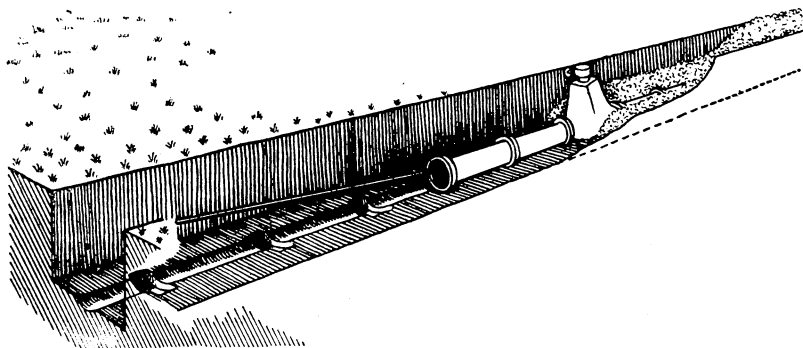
Installing vitrified sewer-pipe distribution system
